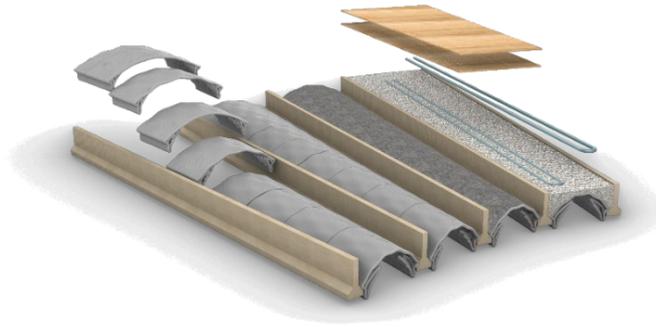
Exploded Axonometric of the 3dcp hybrid slab, showing assembly of elements
